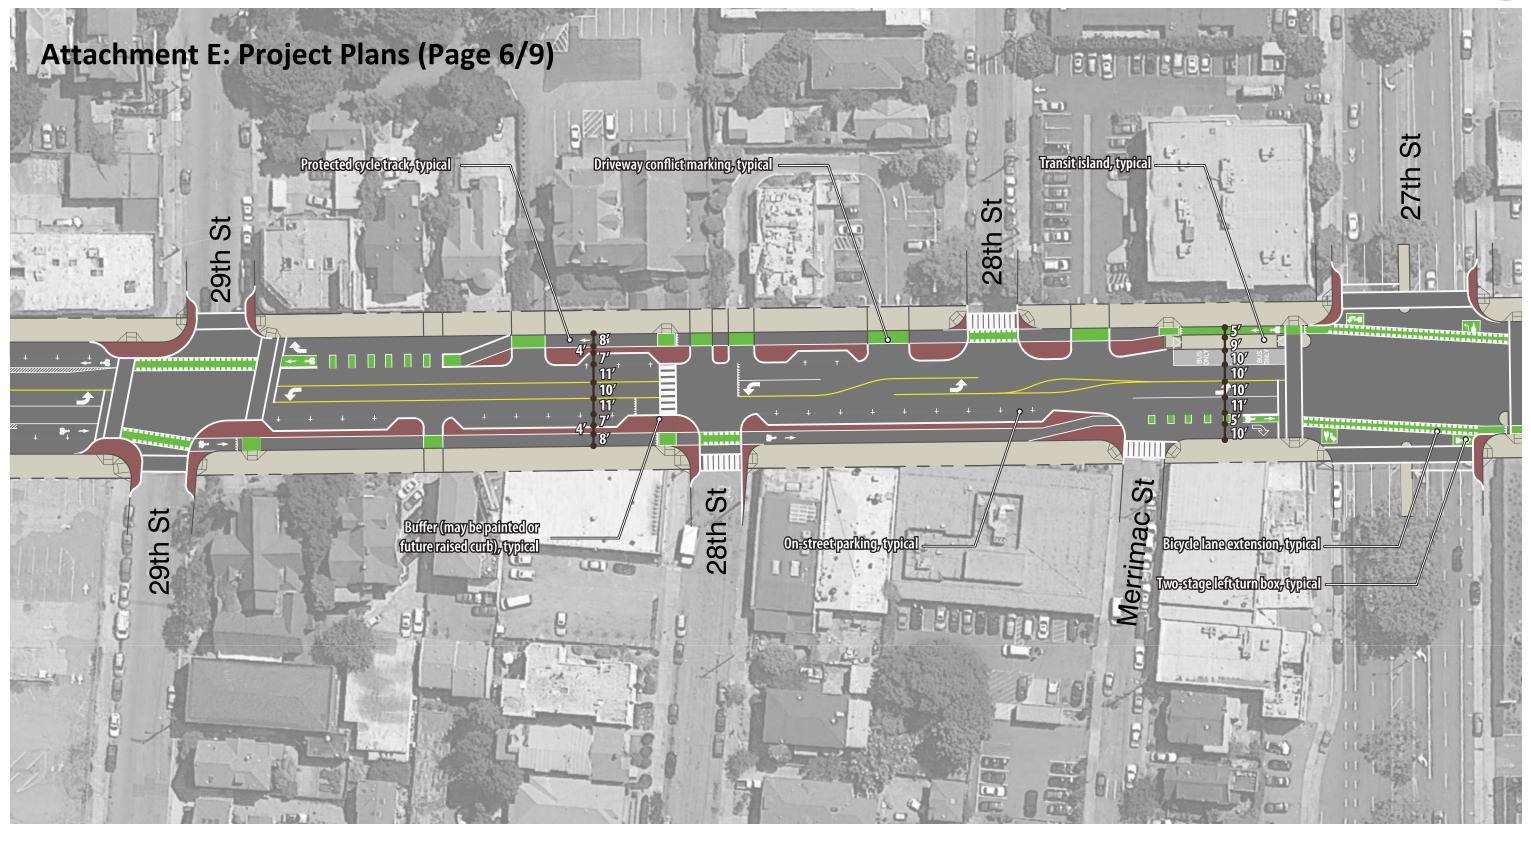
Final Concept Plan Segment Drawings - 29th Street to 27th Street. The figure depicts a possible cycle track configuration.
